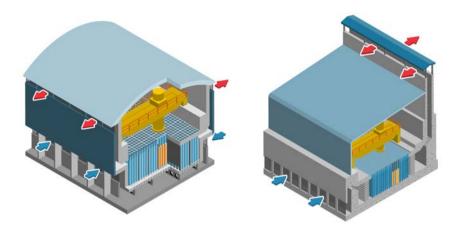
Cross-section views of (left) storage building with canisterized fuel and (right) bare fuel.
